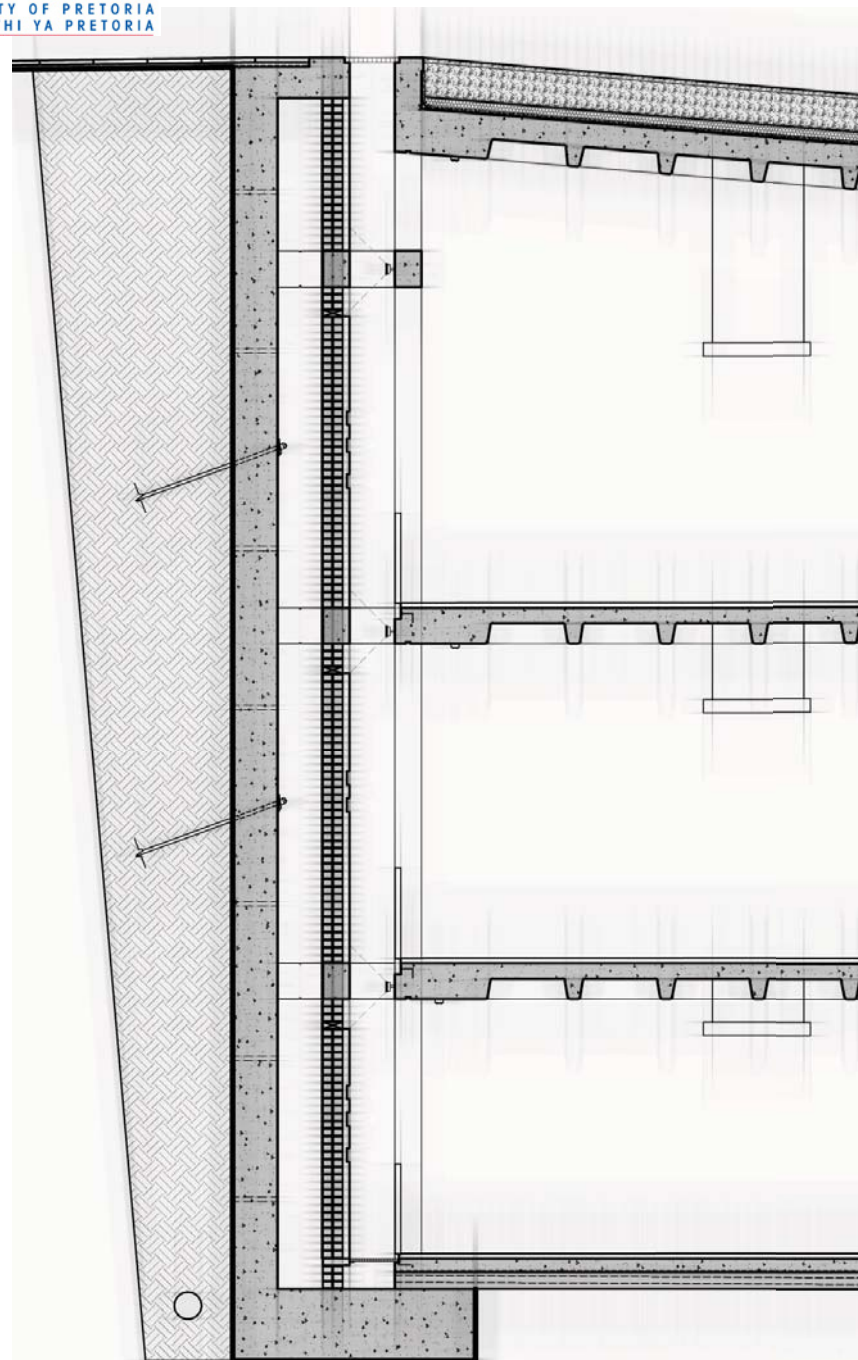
Basement retaining wall construction and articulation. Scale 1:100 (Author, 2011).
